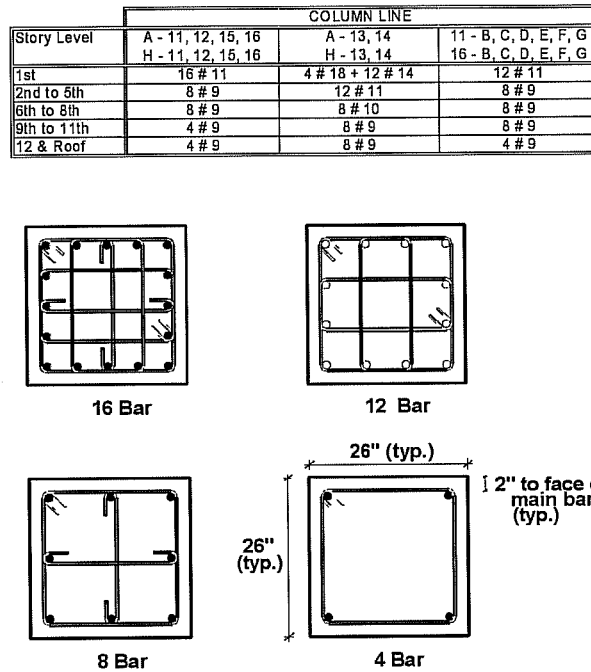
Column reinforcement details and schedule for the 12-story building.
